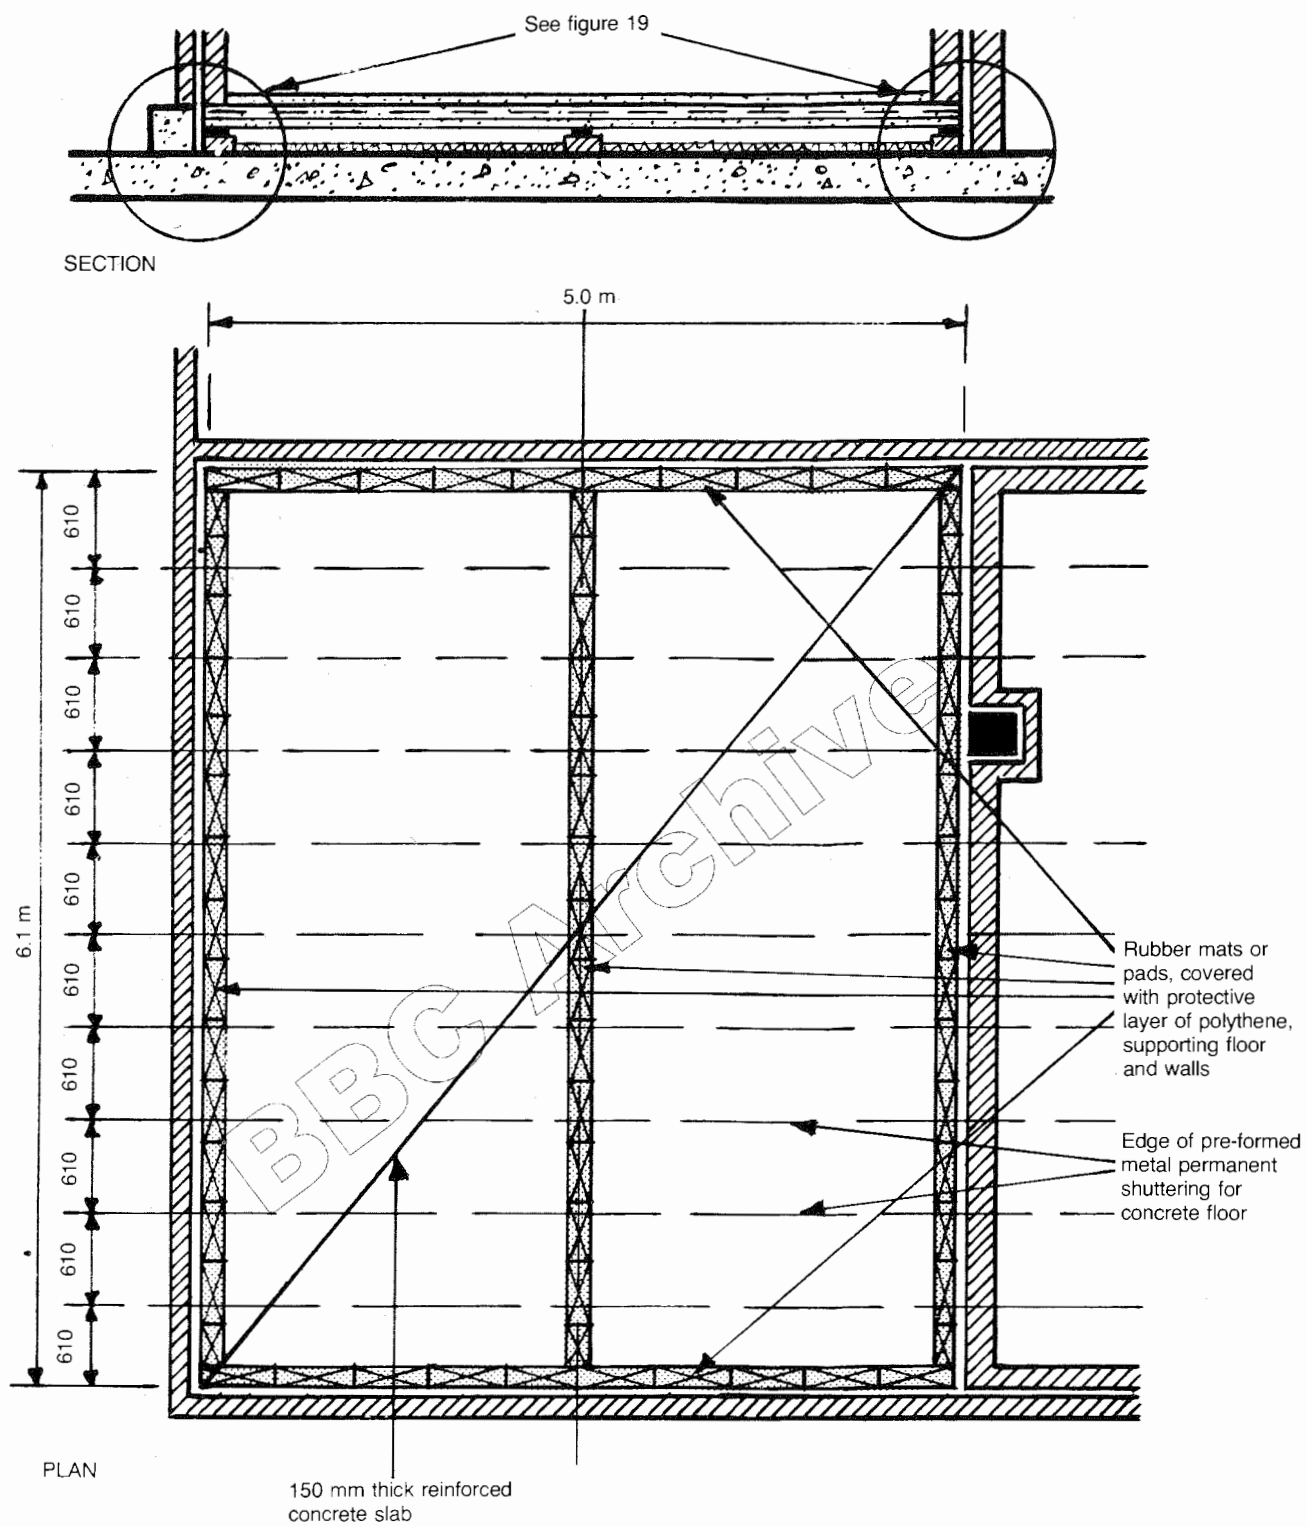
Plan and Section showing typical layout of rubber mats or pads under a floated concrete floor with the walls and ceiling supported off the floated floor
